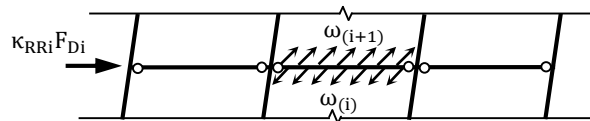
Tension field forces and modified design load in an intermediate floor of frame 5.4b
